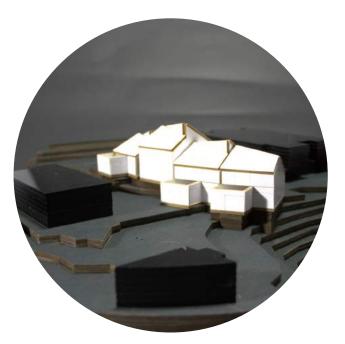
North West perspective of final design Fig.5.25. South East perspective of final design
